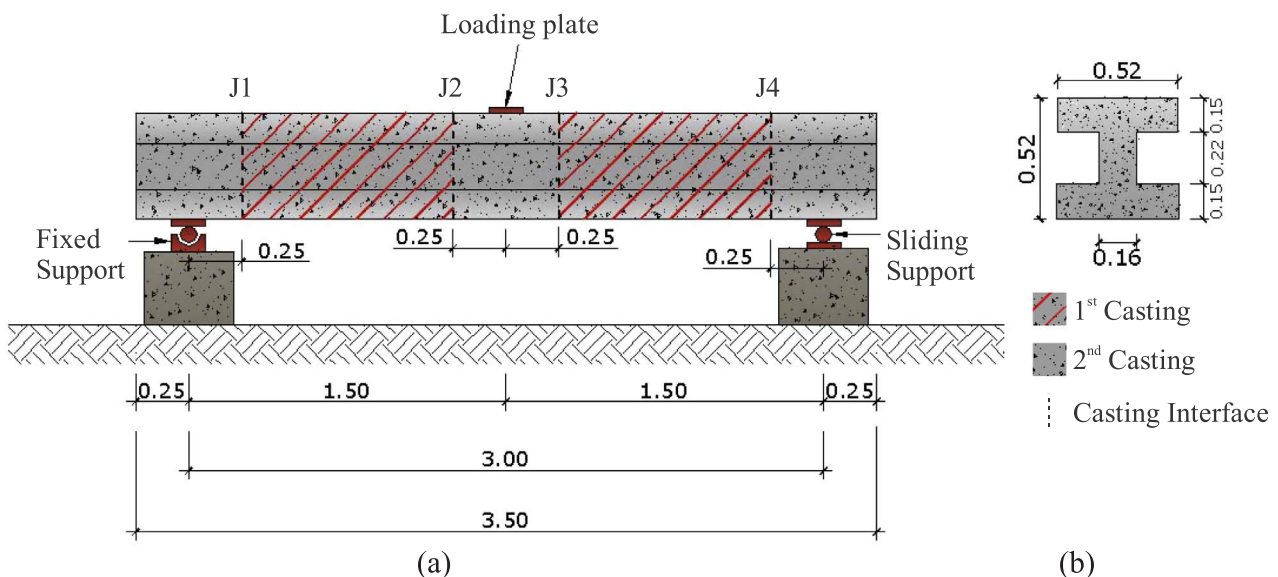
Standard beam specimen: (a) side view; (b) cross section.
